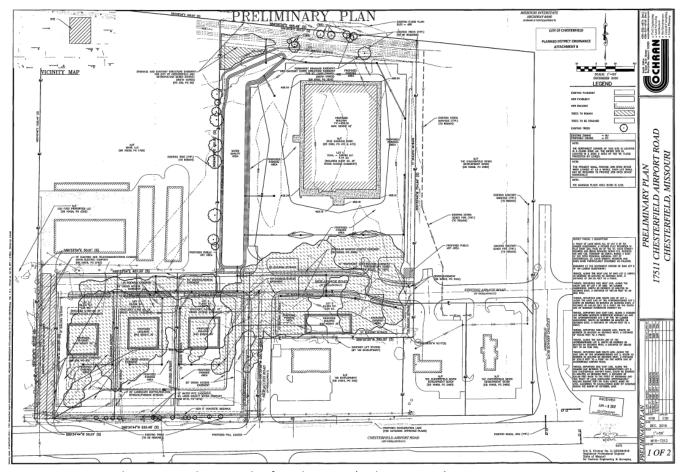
Existing Preliminary Development Plan for Subject Site (Ordinance 2969)
